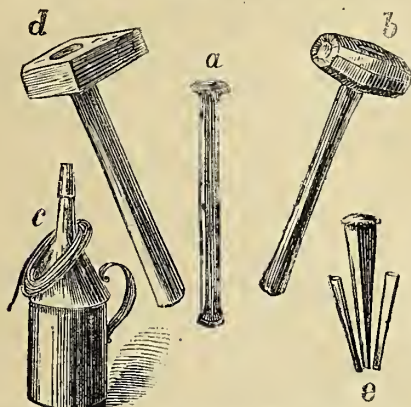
TOOLS FOR BLASTING AND BREAKING ROCKS.
